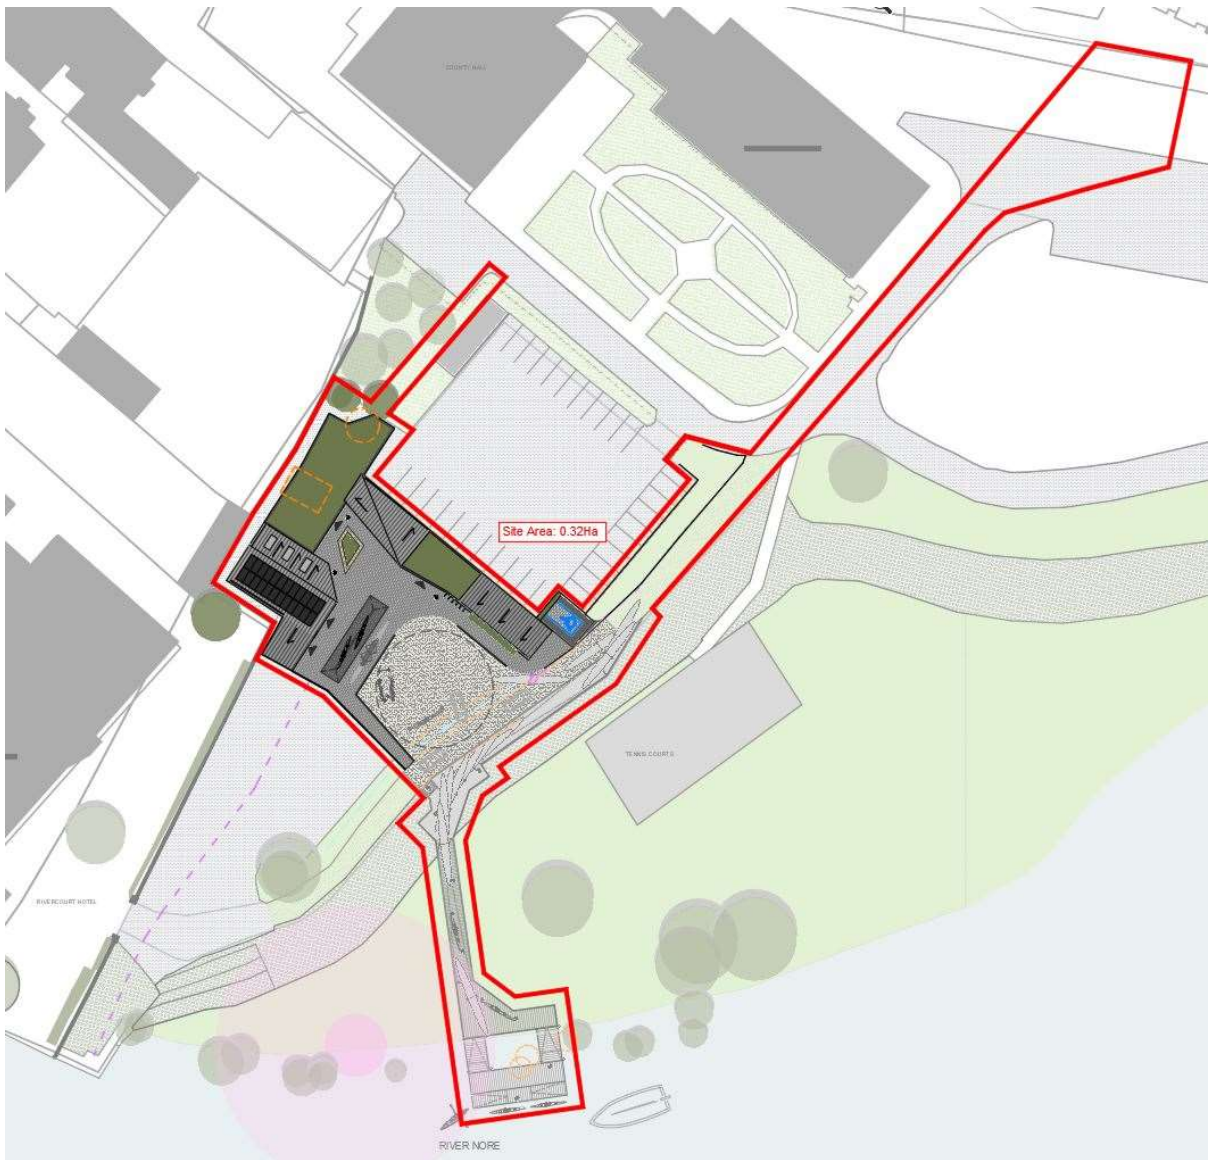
Proposed Site Layout Plan (Ailtirí Architects)
